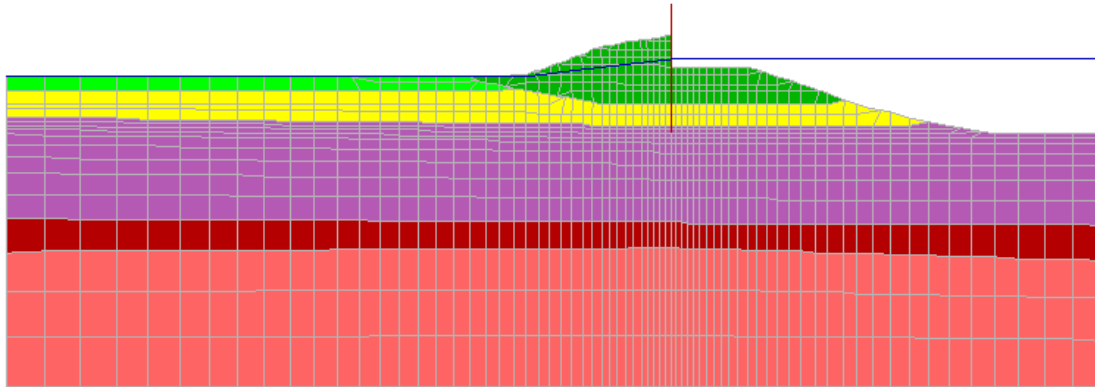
Soil zones, levee wall and sheet piles and normal Pool for 17th St. breach sta. 10+00
